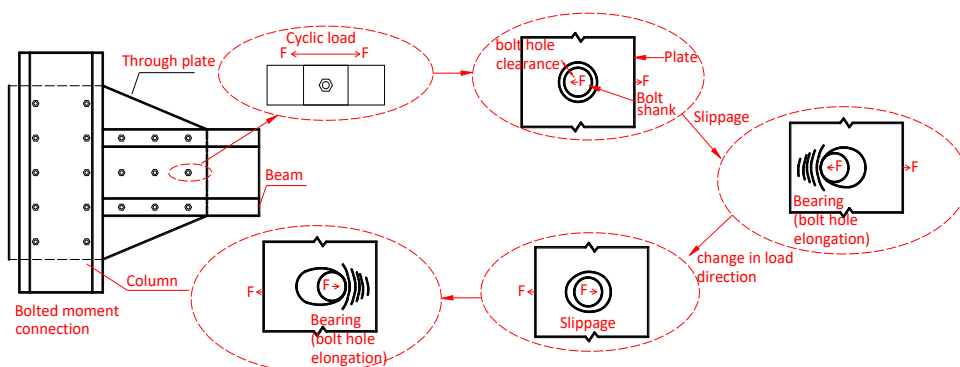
Slippage and bearing behaviour of a CFS bolted moment connection with friction-slip mechanism
